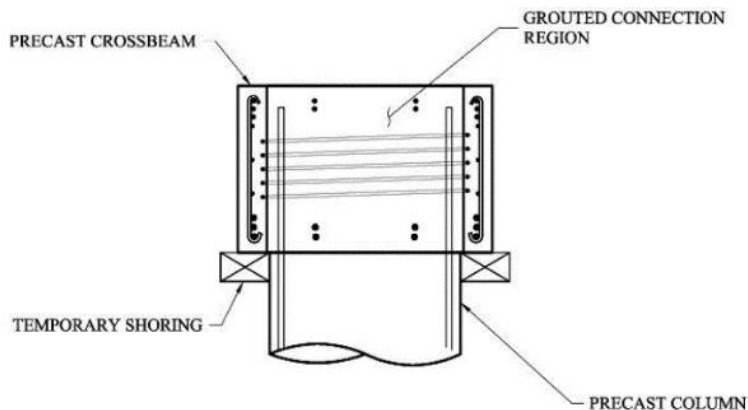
Column and cap beam splice sleeve connection proposed by Hieber et al. (2005)
